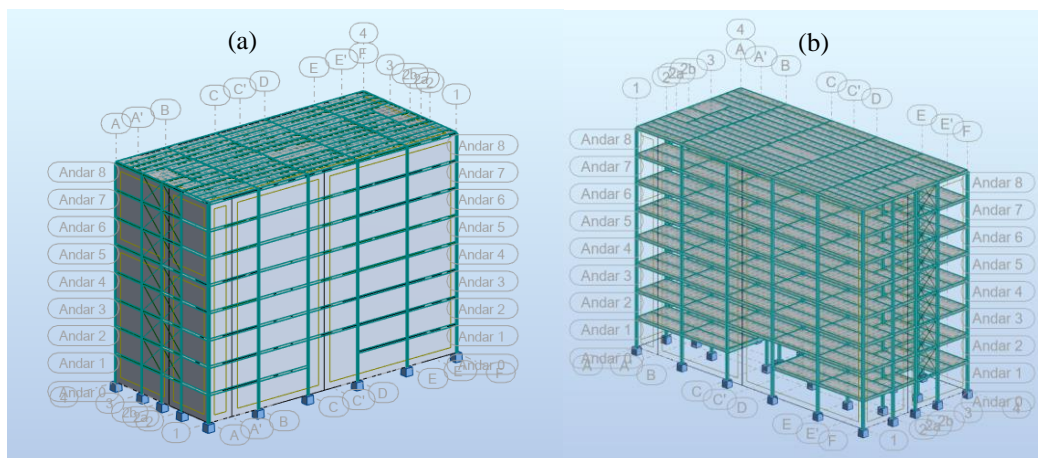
Complete building modelling: (a) Building with side panels in order to apply the wind design loads and (b) Building show the interior slab shell elements. Source: Authors.
